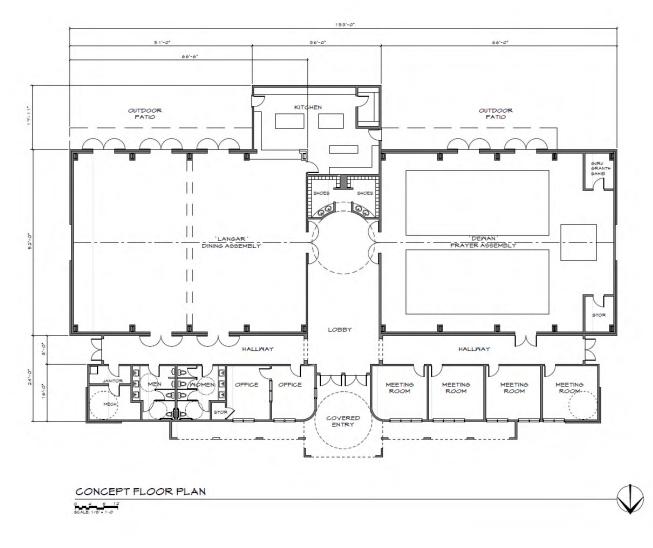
Concept Floor Plan (Source: Chuck Peterson Architect)
